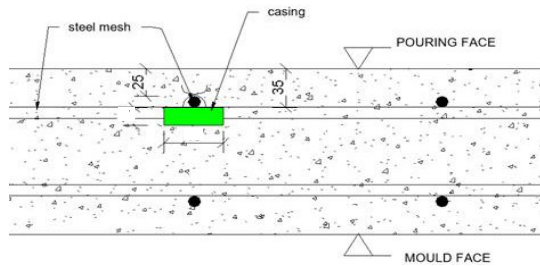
Sketch showing the location of sensor (in green) in the cross-section of the concrete panel.
